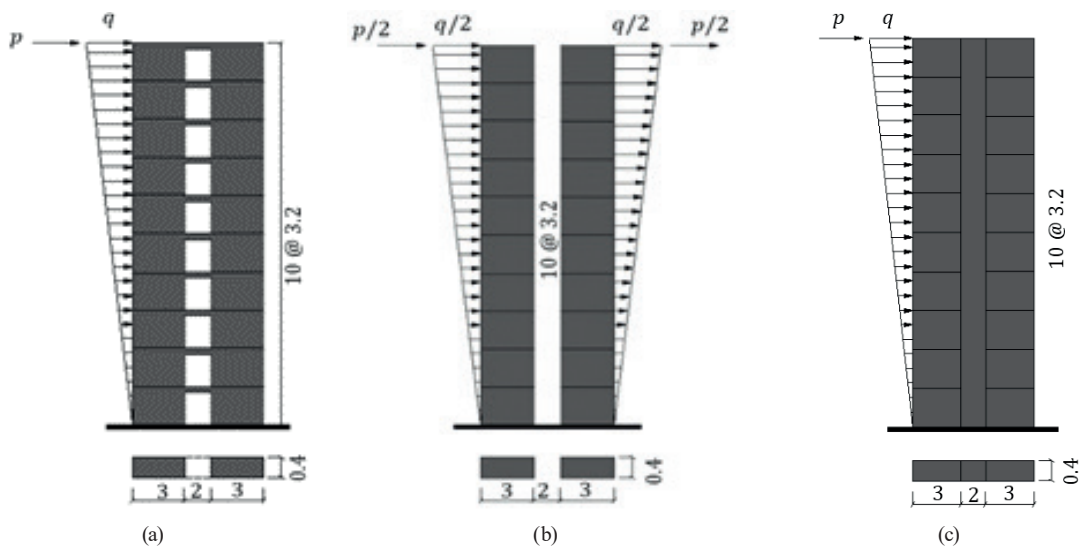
(a) 10-story coupled shear walls system, (b) 10-story separate shear walls system, (c) 10-story steady shear wall system
